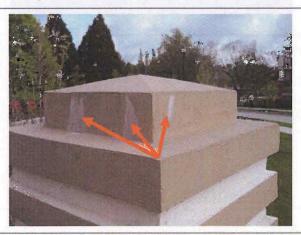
Efflorescence stains to a concrete pillar at the stairs leading to the level four plaza deck.
